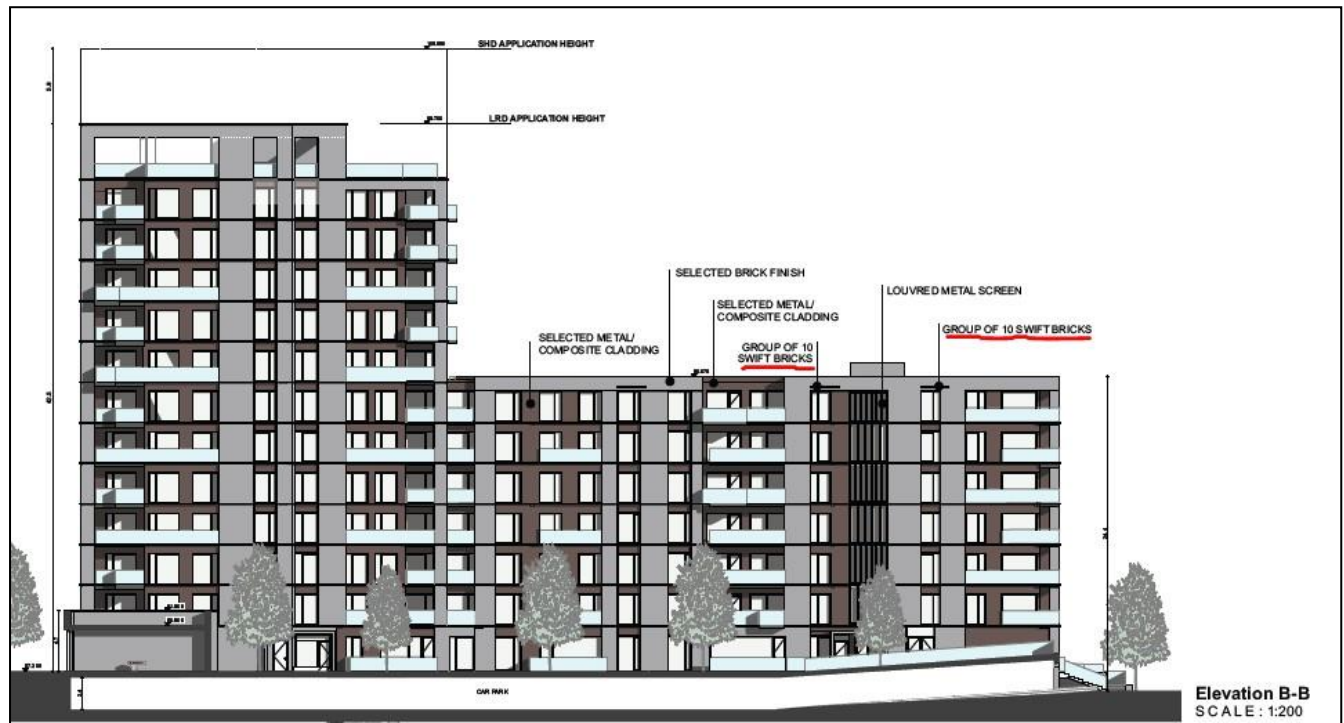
EXAMPLE LOCATIONS OF SWIFT BRICKS ON WESTERN ELEVATION OF BLOCKS A & B (SOURCE: DAVEY SMITH ARCHITECTS, LAYOUT ID: D1809.P20)
